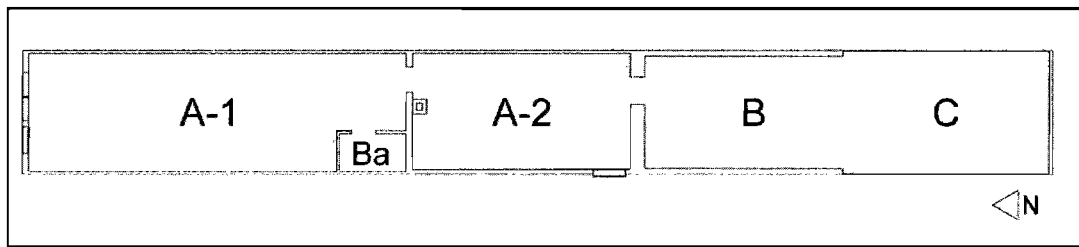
The Jeff. Smith's Parlor Museum plan with room labels.
